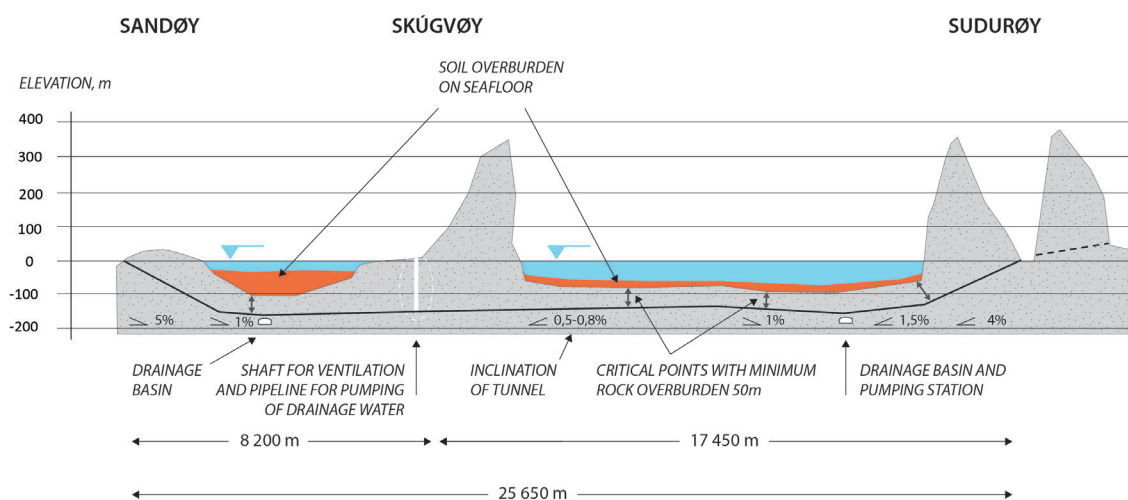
Tunnel alignment option 2 with one long tunnel passing under Skugvøy with ventilation shaft. Longitudinal section.
